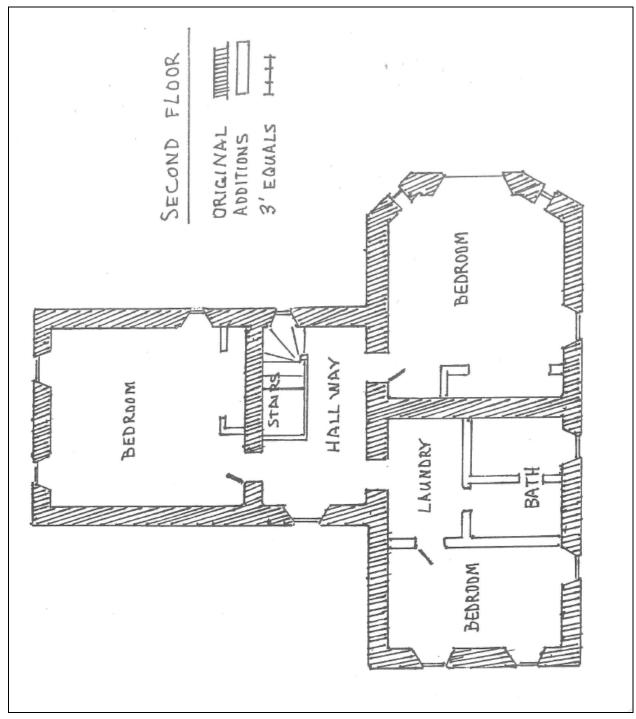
Sketch plan of second floor of Hancock House (Blaine Dabb 2011).
